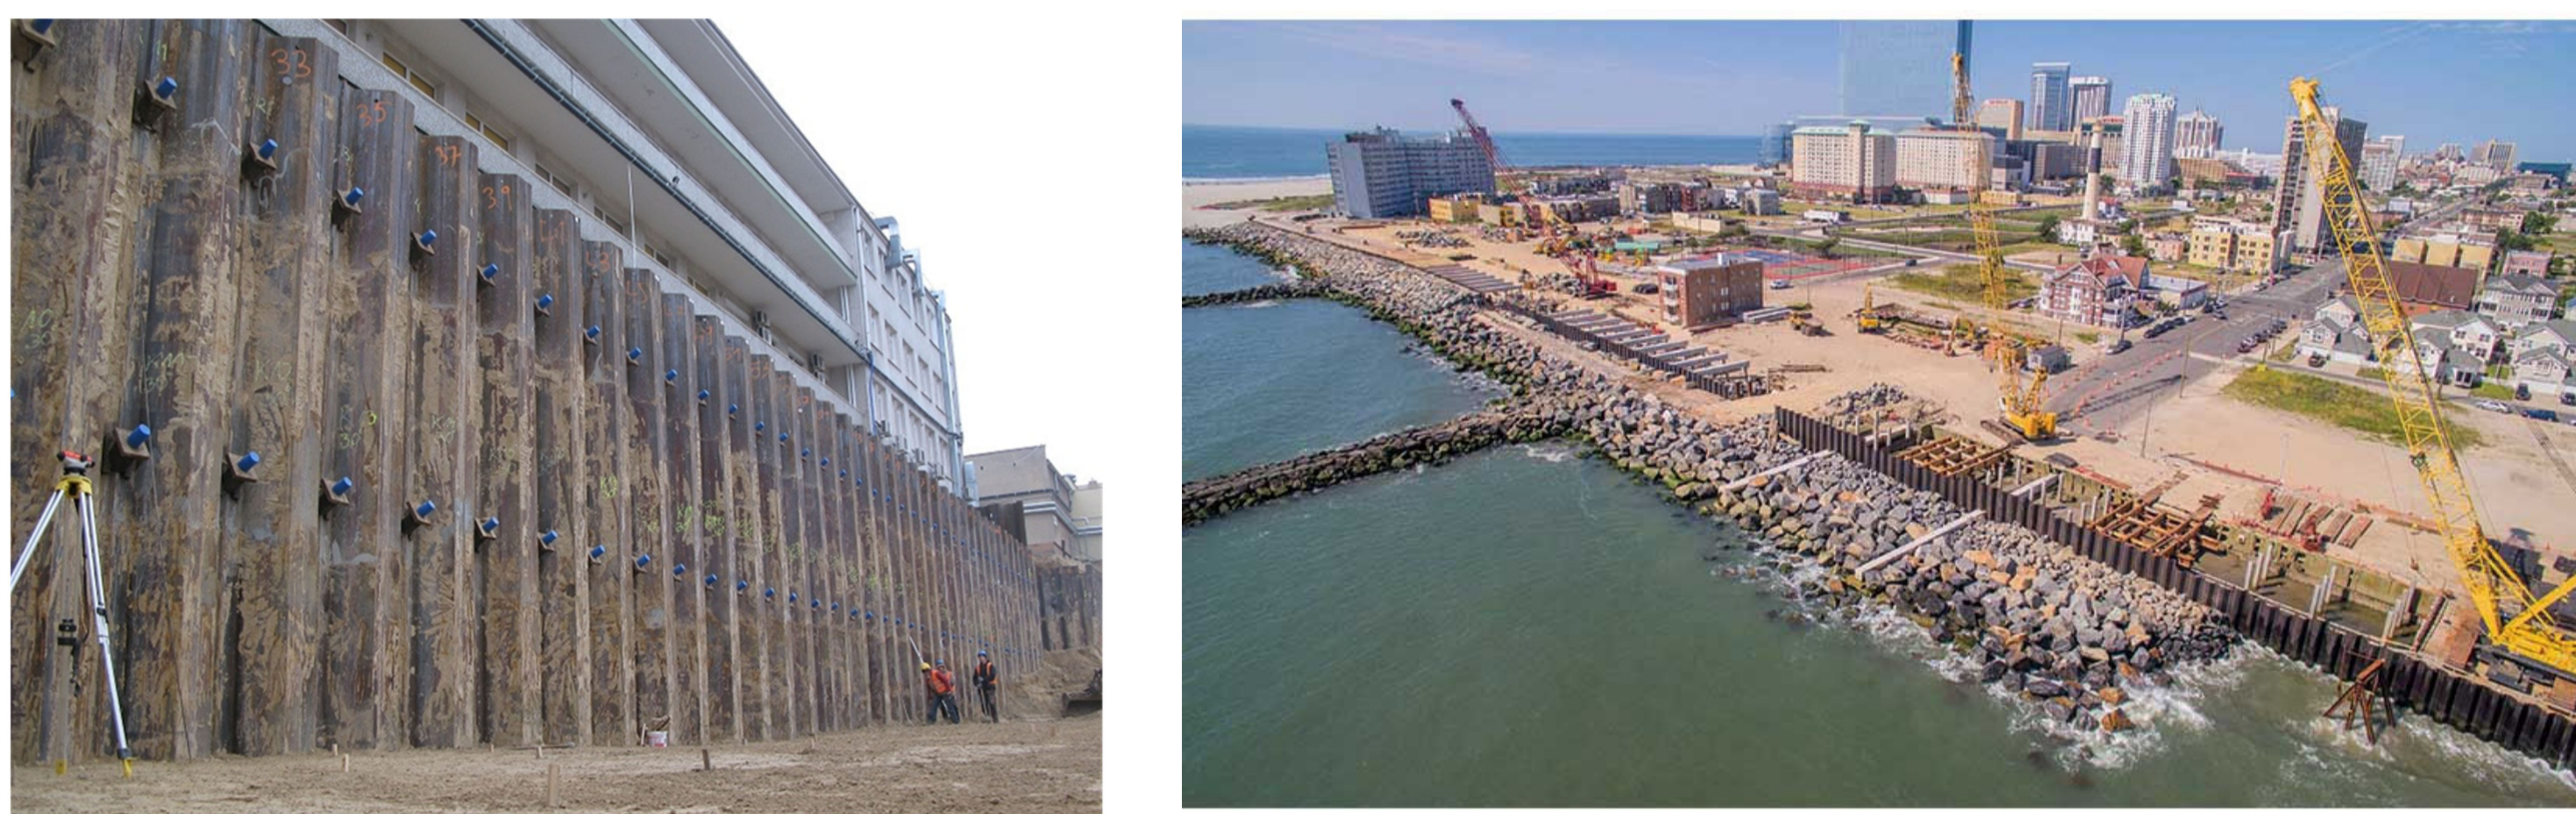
Applications of retaining walls near existing buildings (photo courtesy of Aarsleff Ground Engineering Ltd. and U.S. Army Corps of Engineers Philadelphia District respectively).
